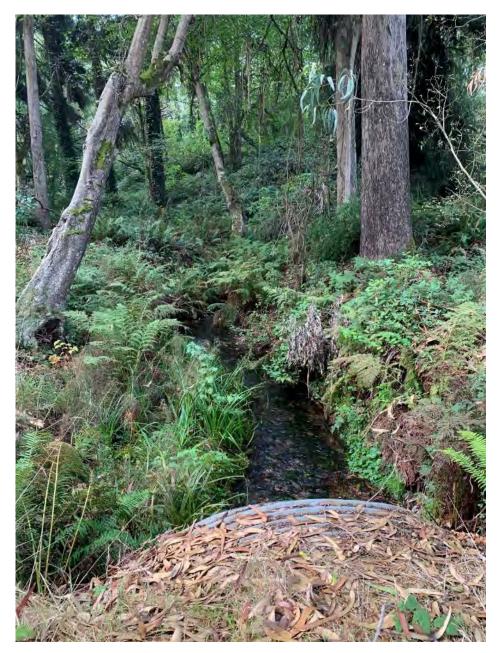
A perennial stream passes through a large culvert under the access road at the confluence of Norton Creek and Widow White Creek. (Highway Crossing Project)
